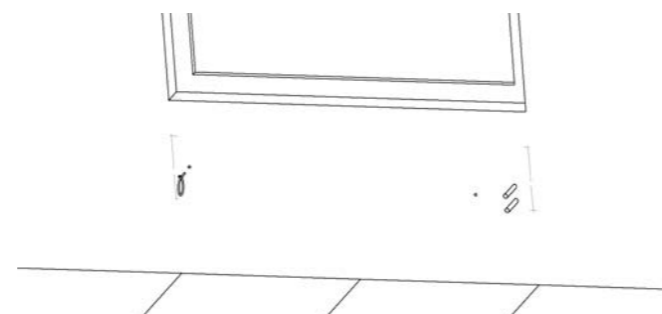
Drill the mounting holes. Install the pipes and power supply cable as appropriate.
